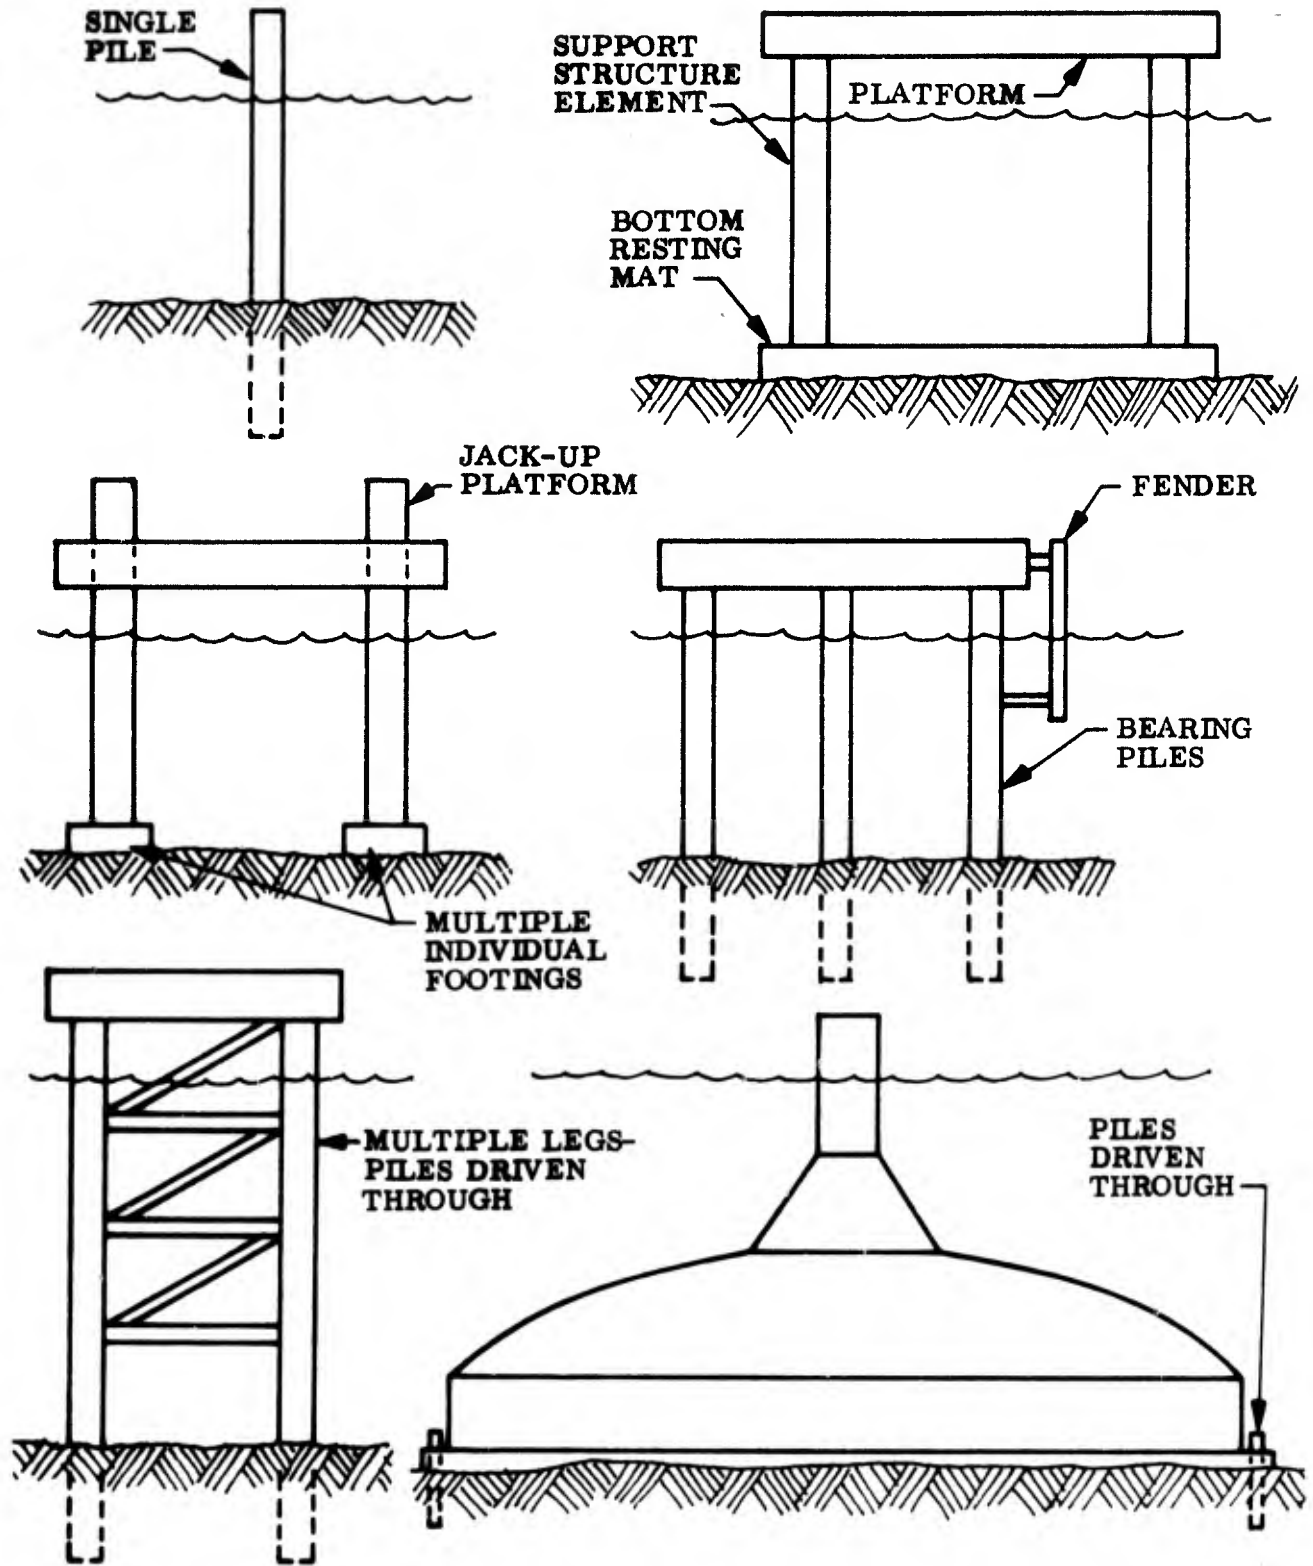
Typical Bottom Mounted Surface Structures
